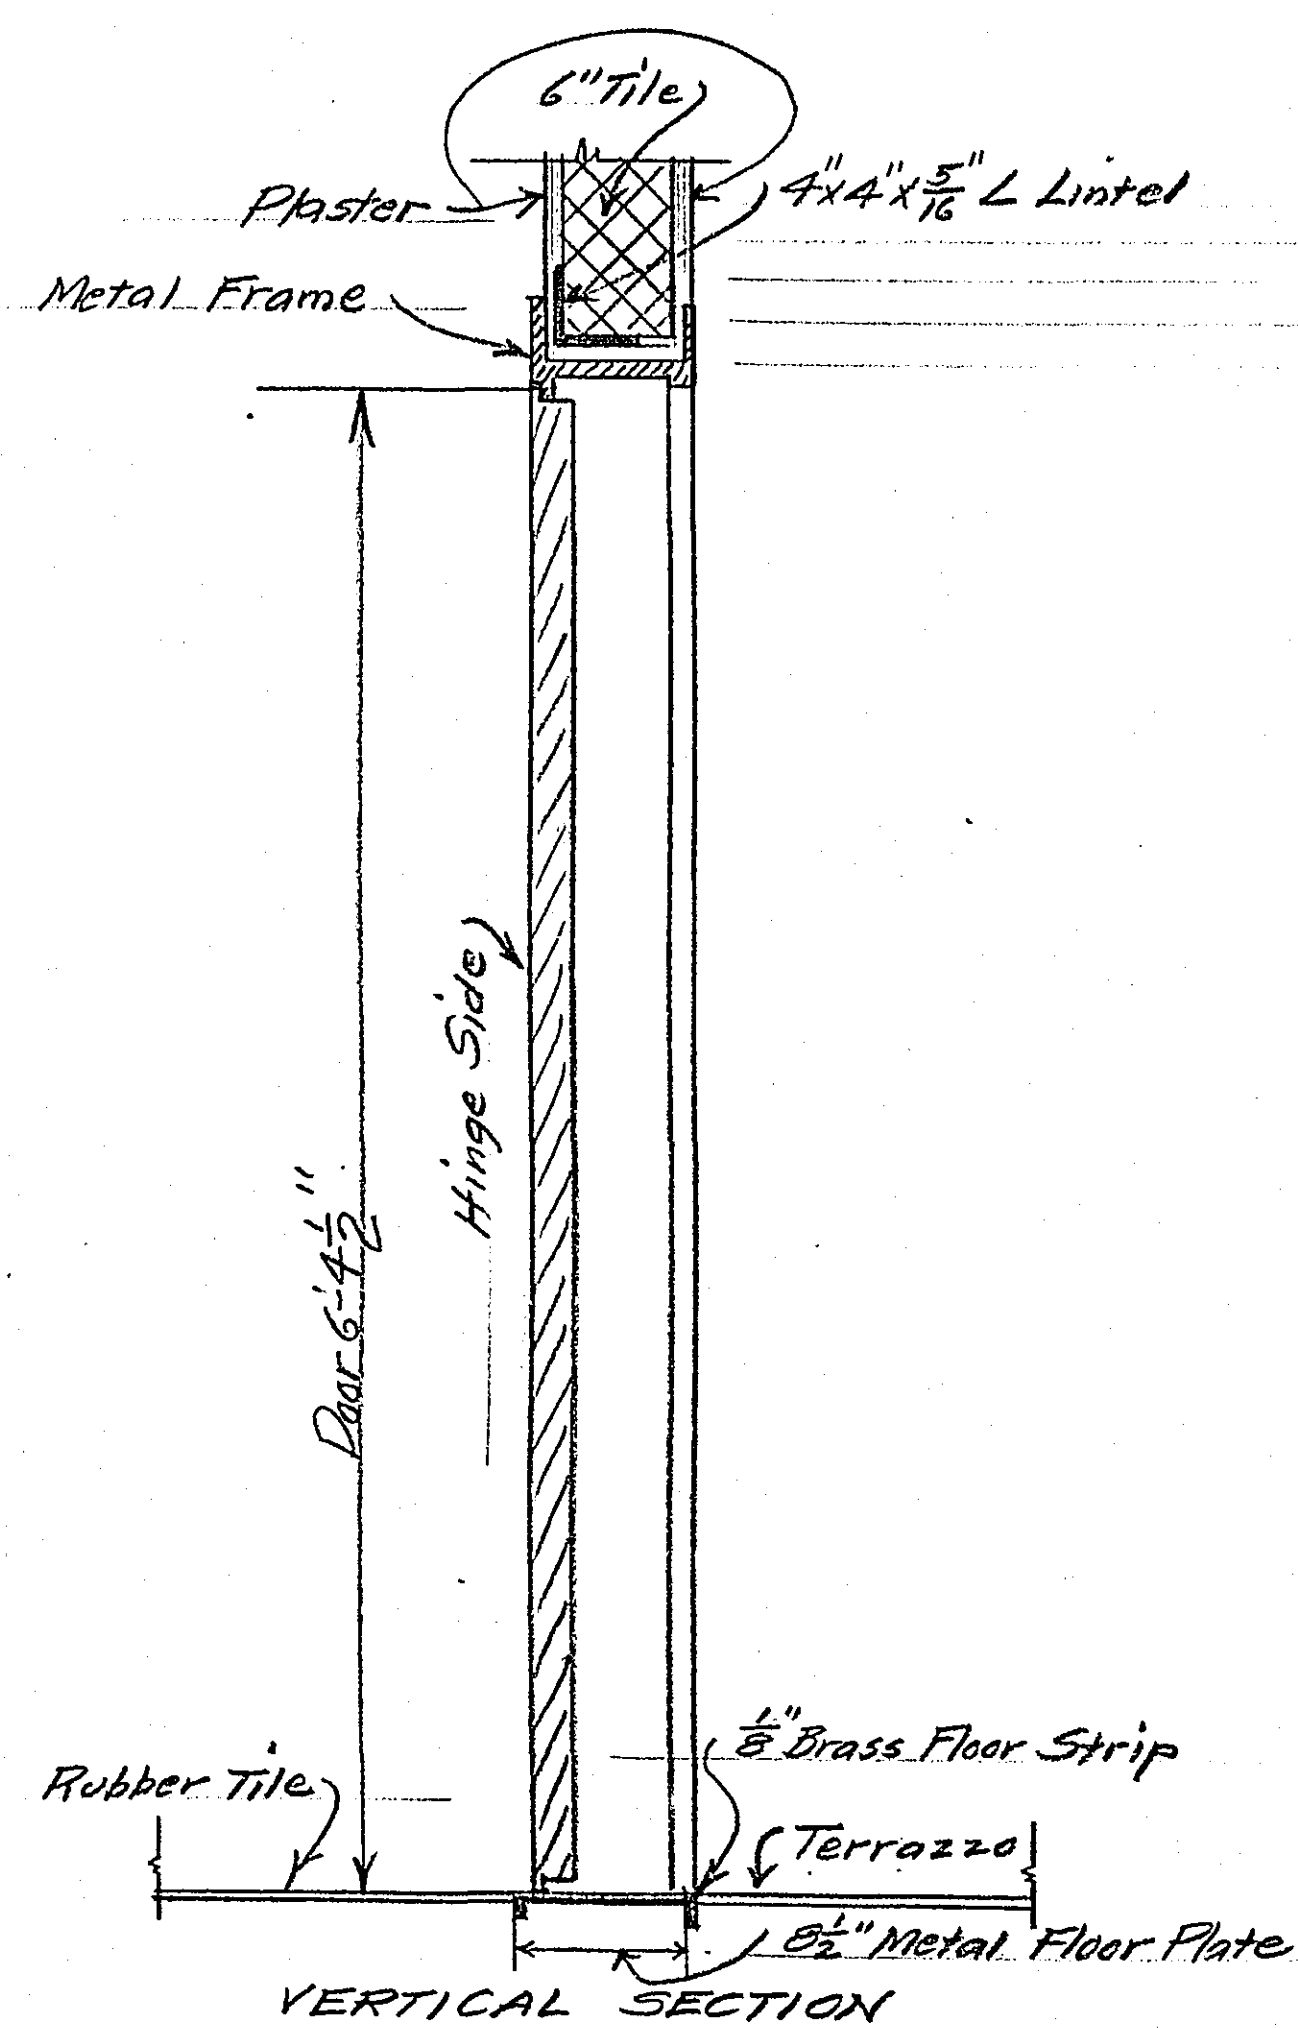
DETAILS OF DOOR AND FRAME IN NEW LOCATION - SCALE 1 1/2"=1'-0"
